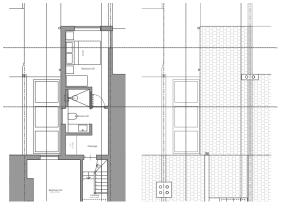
Existing outrigger - proposed first floor layout and roof plan
